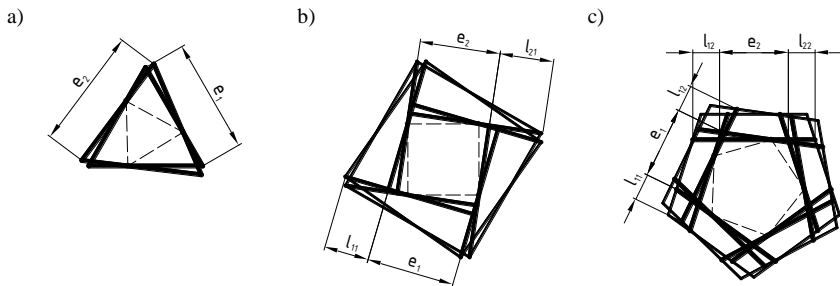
Systems of beams supporting the next floor slabs of the buildings of twisted forms.
